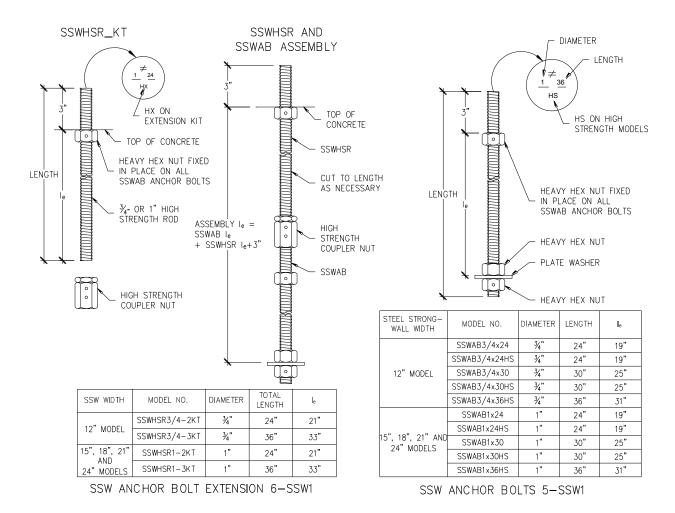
STEEL STRONG-WALL ANCHORAGE DETAILS (Continued) (5,6/SSW1, 6/SSW1.1)
